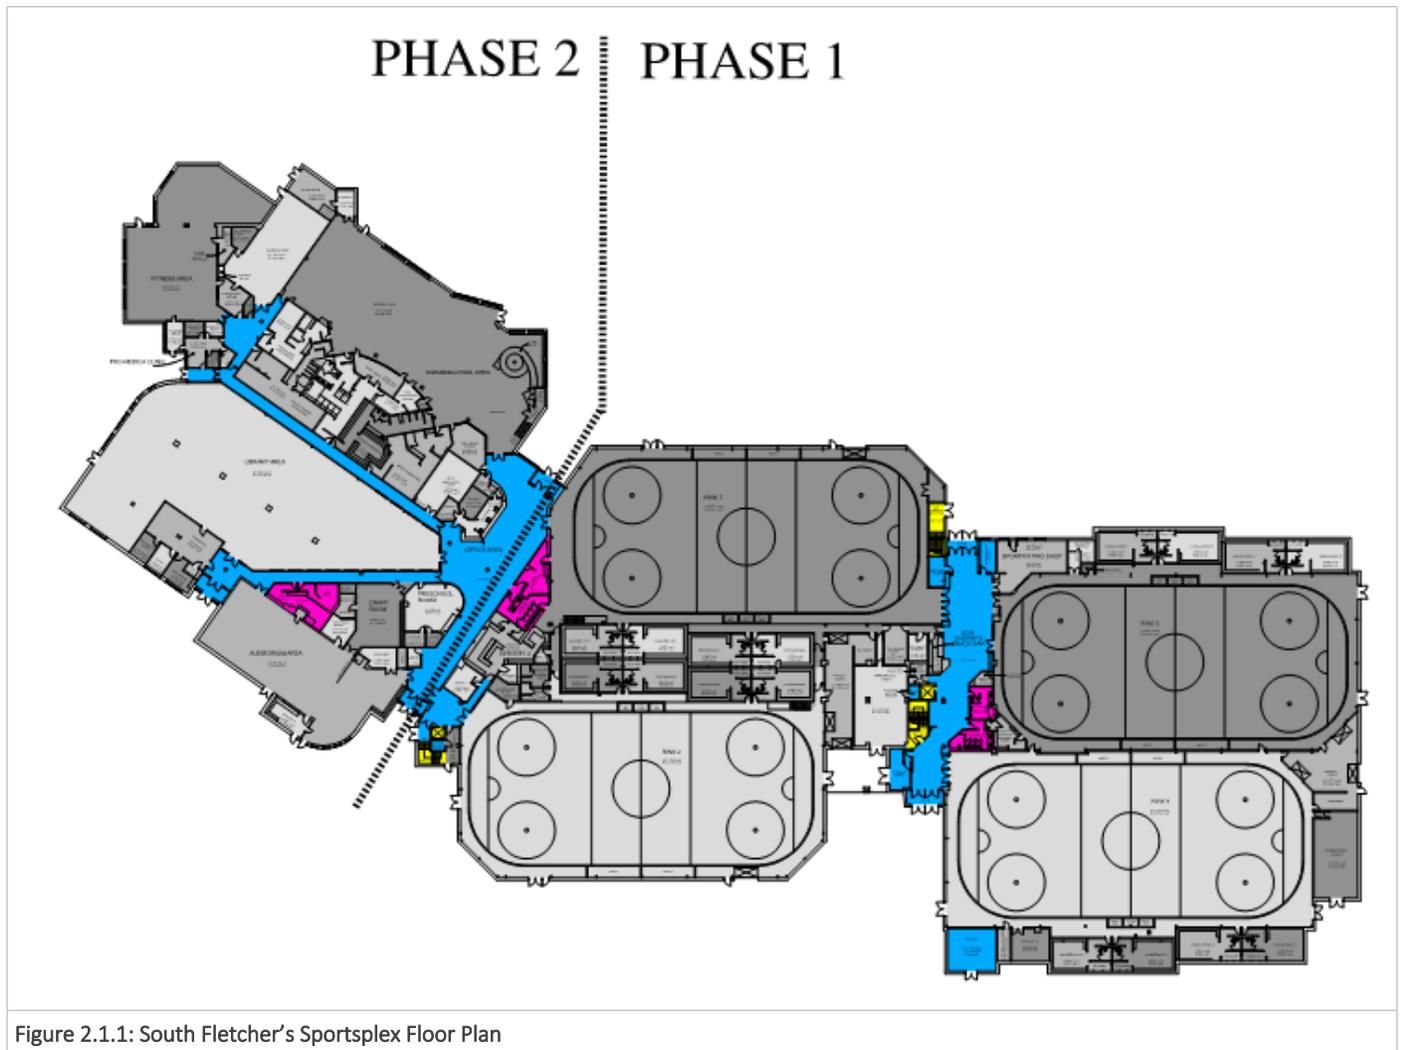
South Fletcher's Sportsplex Floor Plan
